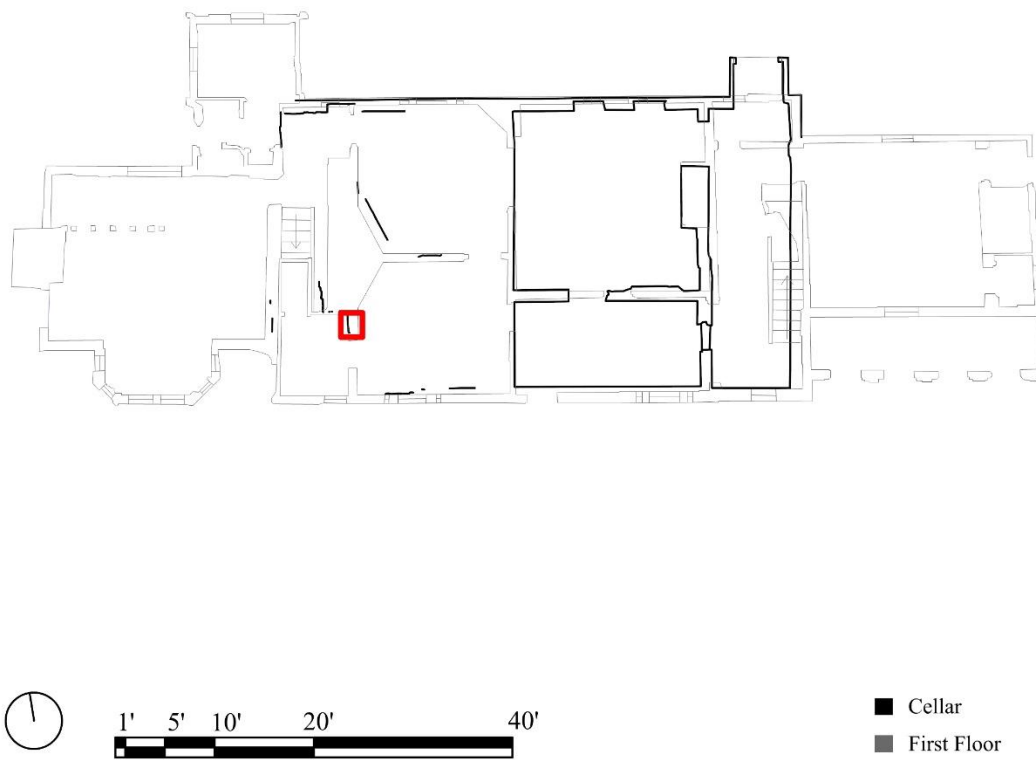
The cellar floor plan overlaid with the first-floor plan reveals that the column visible from the hole in the western wing is situated under the wall that divides Campaign One from Campaign Three.
